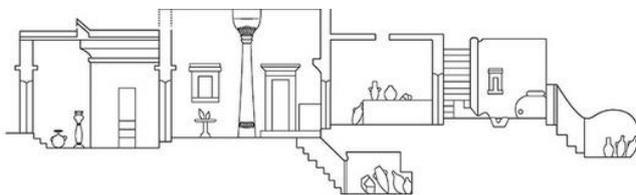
plan Deir el-Medina house based on the substantial architectural remains at the site. Rutherford Picture Library/ source: <https://brewminate.com/towns-and-houses-in-middle-and-new-kingdom-egypt/>
